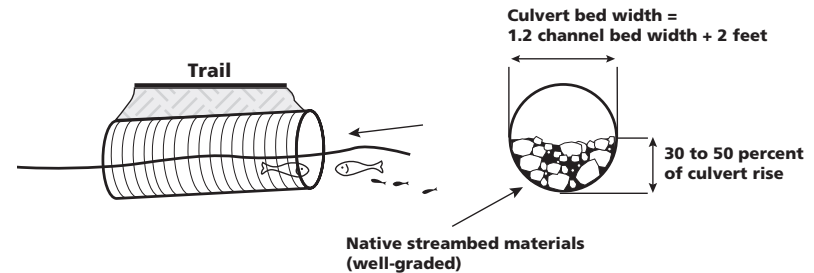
Easy passage. (Fish Passage Design at Road Culverts – Washington Department of Fish and Wildlife)
